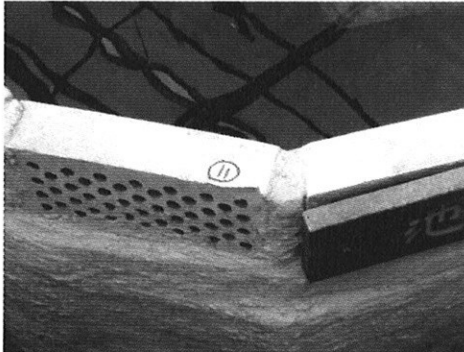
Sound proofing bricks, Fish Pond (Sample No. B/261/06/11)
